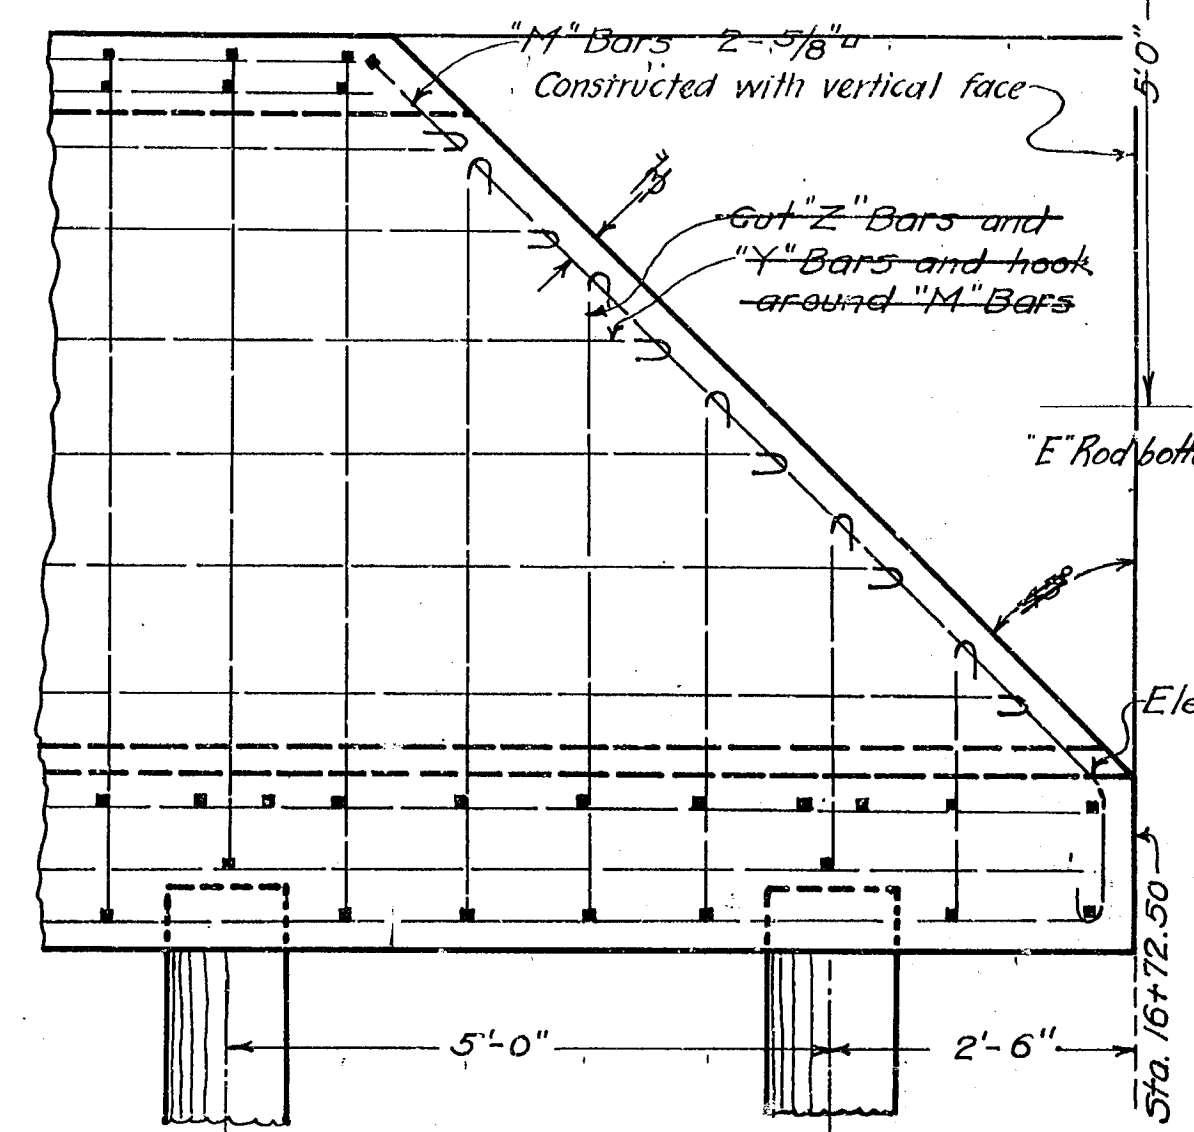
DETAILS OF OUTLET STRUCTURE (SECTION "A")
